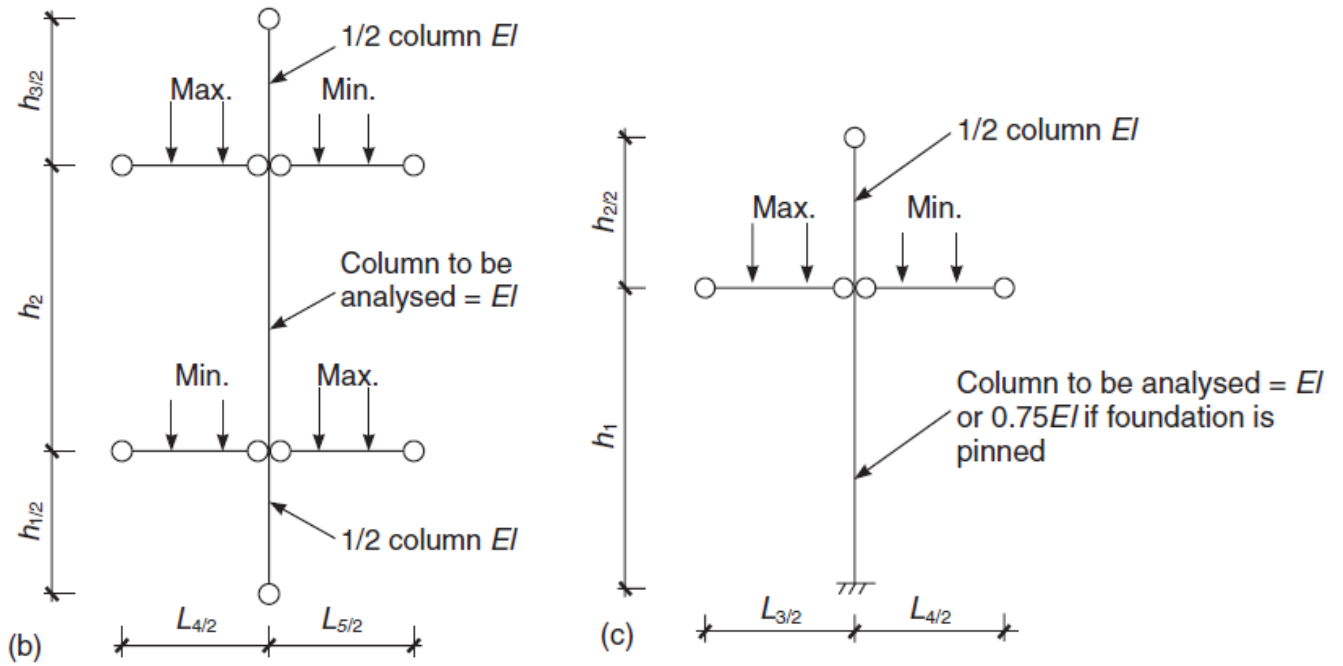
Sub-structuring methods for internal beam and columns in a pinned-jointed frame.
